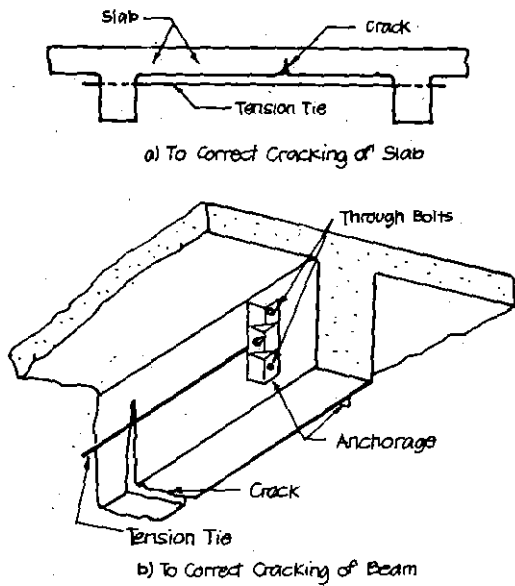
External prestressing can close cracks and restore structural strength. Careful analysis of the effects of the tensioning force must be made or the crack may migrate to another position.
